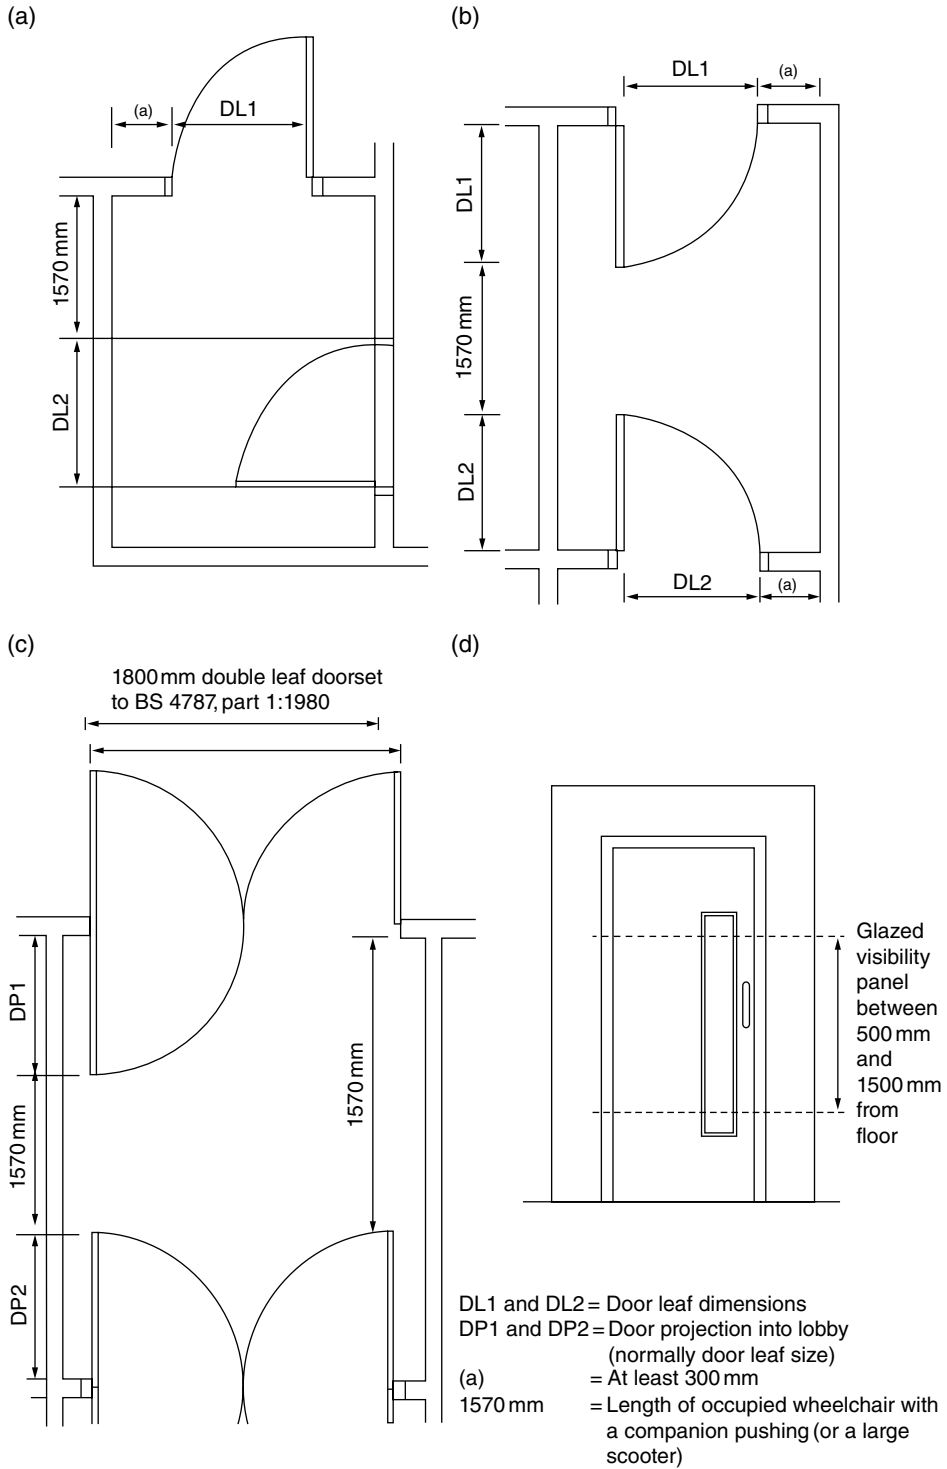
Entrance doors and lobbies. (a) Right-angled lobby, (b) straight lobby (single-leaf doors), (c) straight lobby (double leaf doors) and (d) elevation (single-leaf door).
